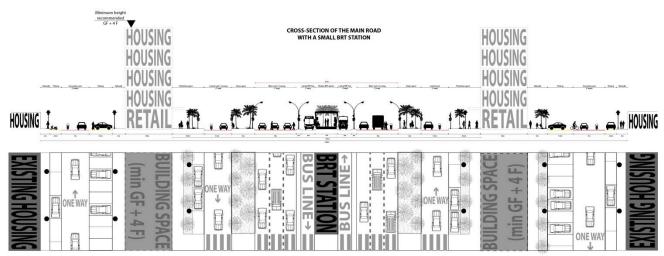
Cross section and plan of the envisioned new situation. Grayed-out buildings are not part of the intervention.
